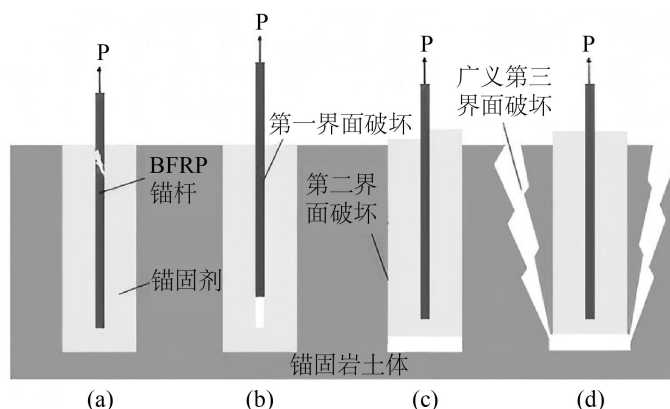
Failure modes of the BFRP anchor bolt anchoring system
